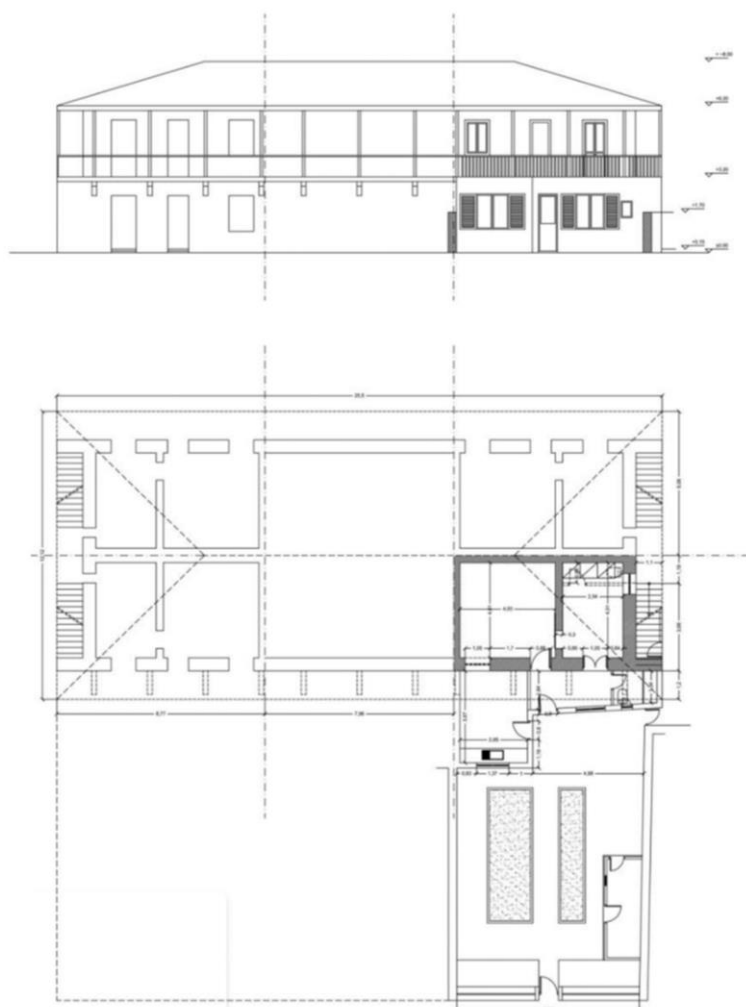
Elevation and ground floor plan of the two-storey refugee housing in Nea Kokkinia with external staircase, protruding gallery and 12 apartments
